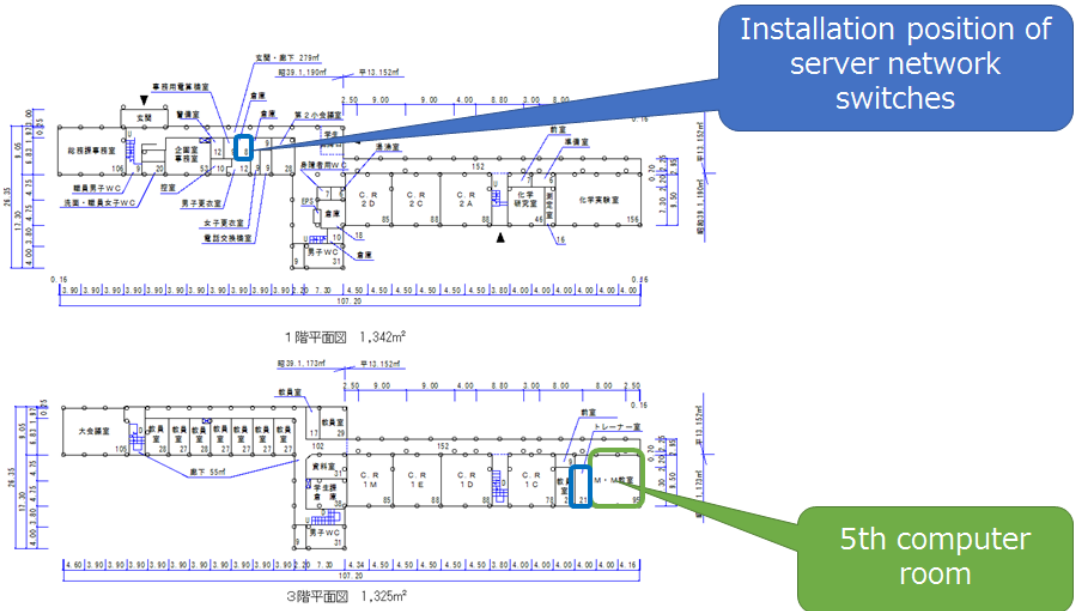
The arrangement of a computer room and others on the first and third floors of Main Building I
